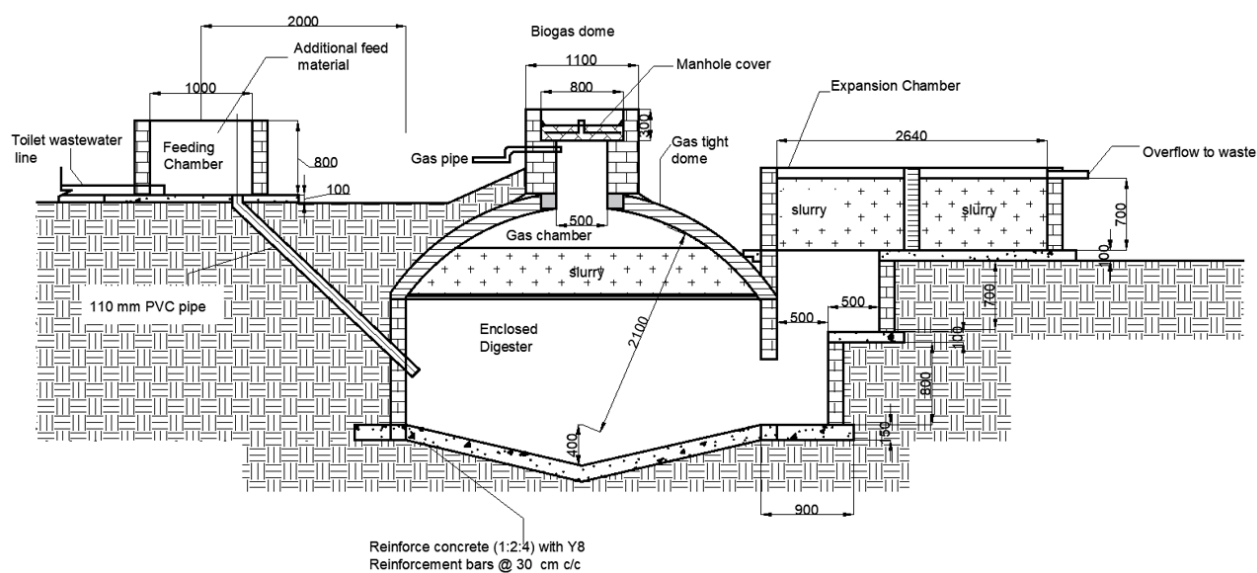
Fixed dome brick material boo gas design: Vertical Section A-A
